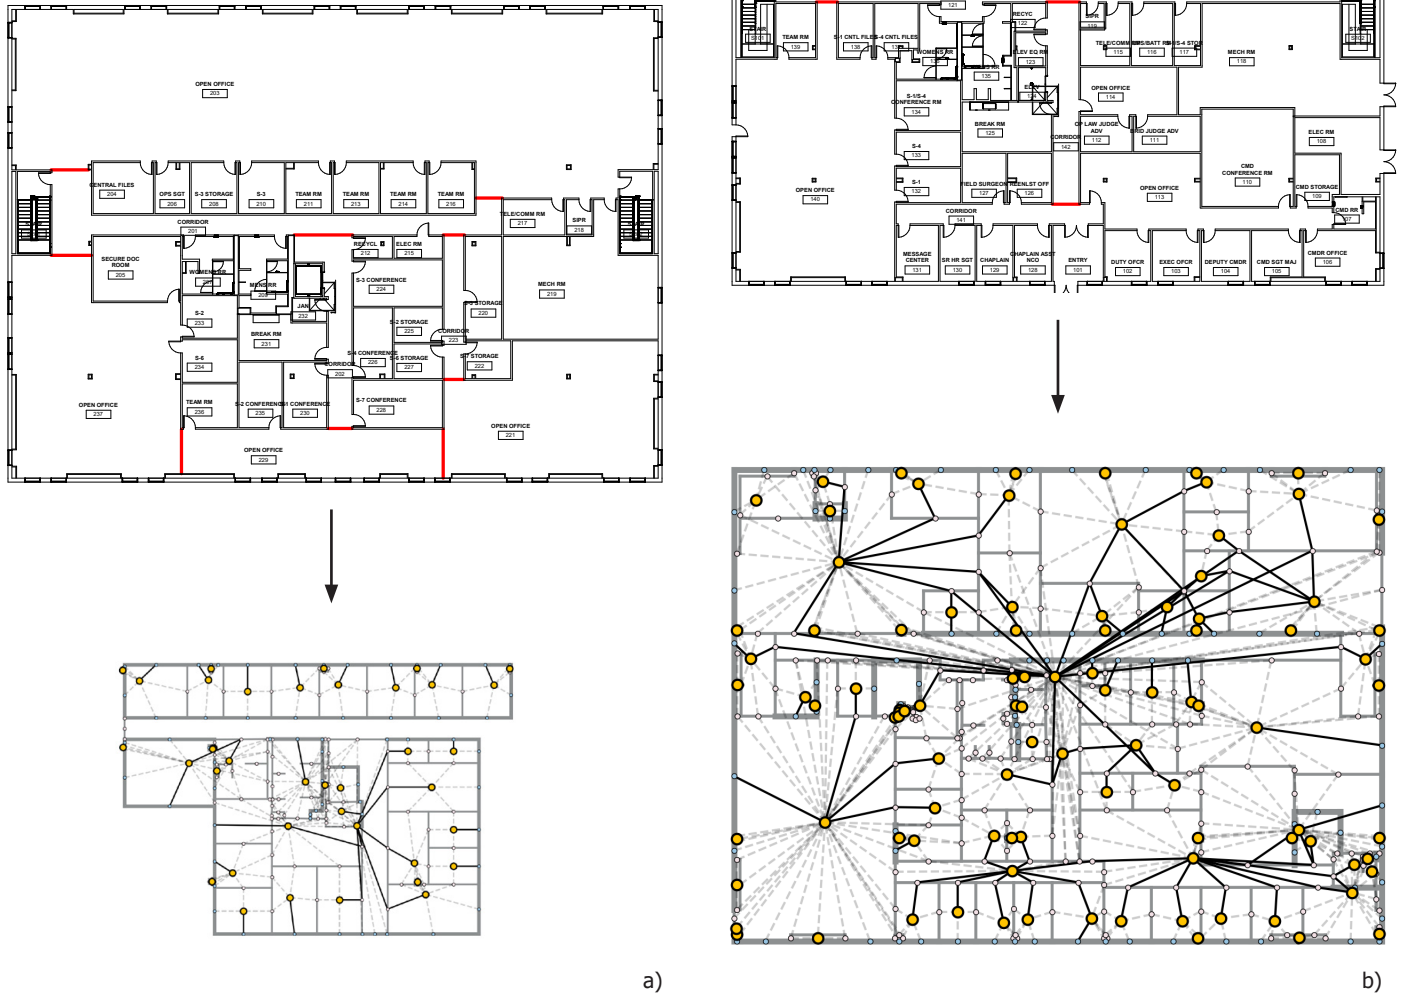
Room connectivity extraction from a floor plan of an office building:
